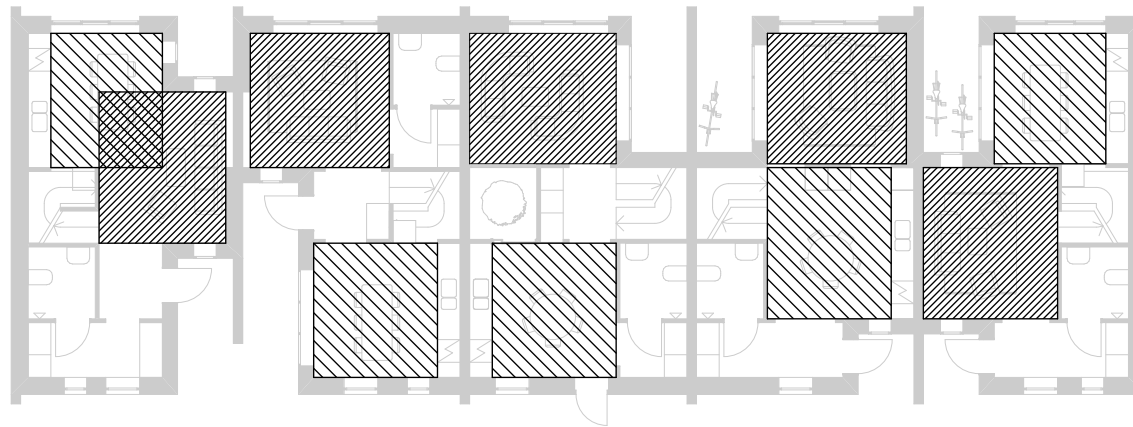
Ground floor connections between kitchen and livingroom 1:200
